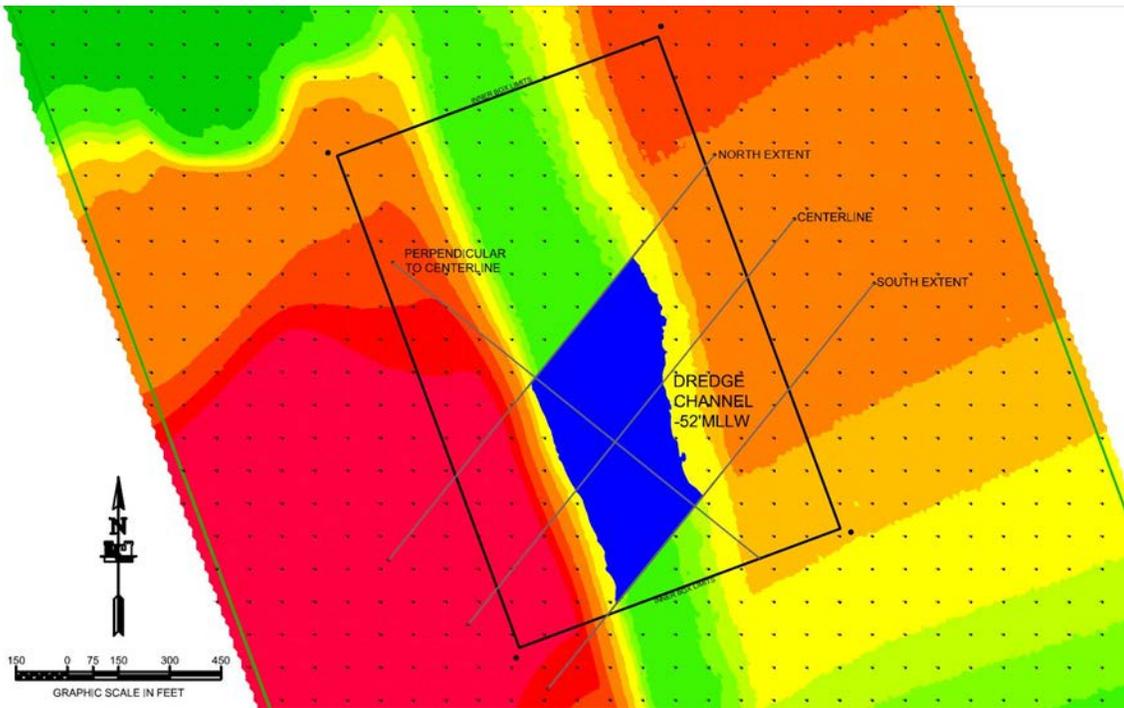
Plan View of Dredge Channel at -52 feet MLLW Depth
